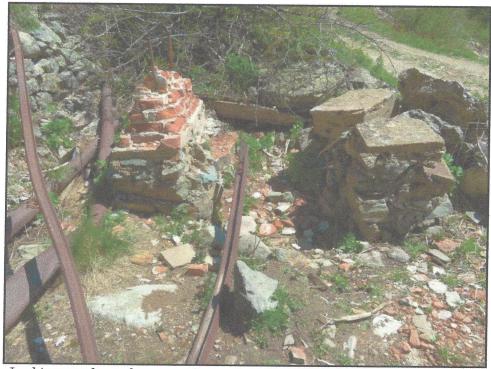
Looking north-northeast at the probable electric motor mount with the building floor remnant behind at the Silver Crown Mine (5SA407).
